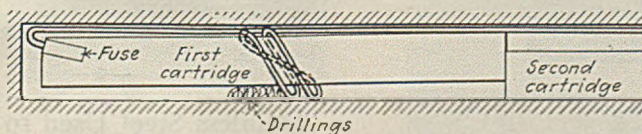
Old Way. Loops Gather Drill Cuttings and Pull Electric Detonator From Cartridge
